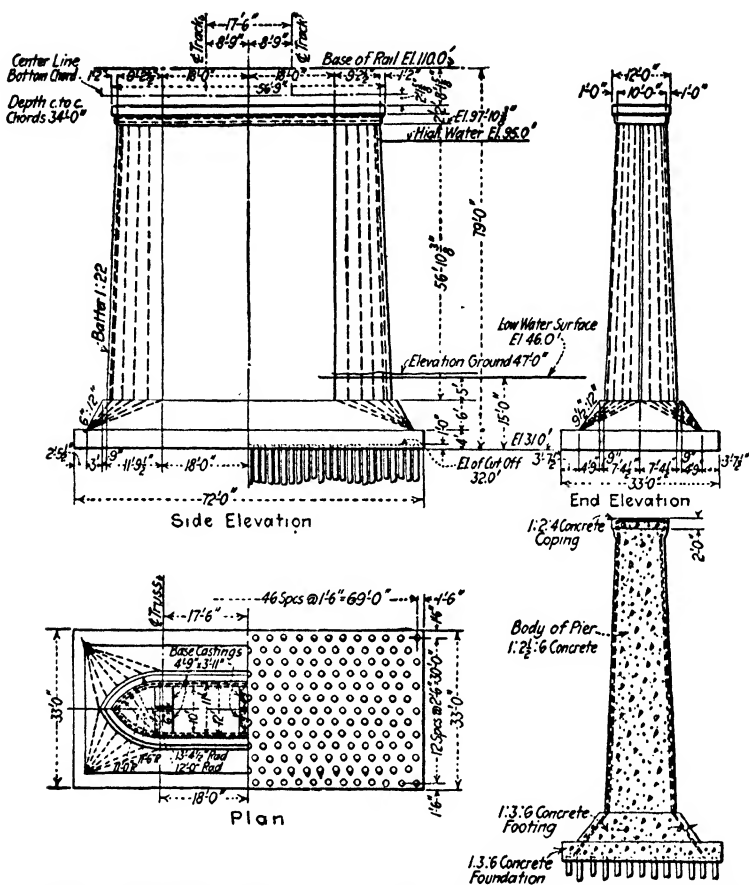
River Pier 5, Illinois Central Railroad Bridge over Tennessee River, Gilbertsville, Ky.
